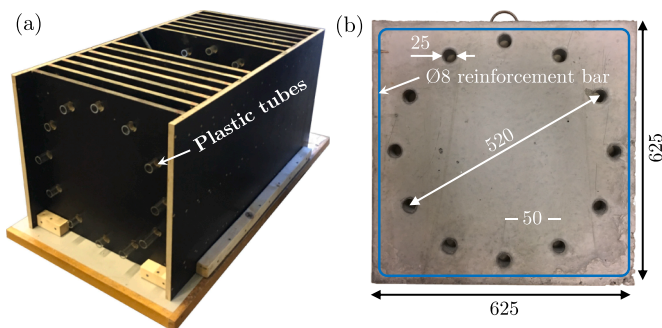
(a) Wooden moulds used to cast slabs and (b) concrete slab with dimensions (in mm).
